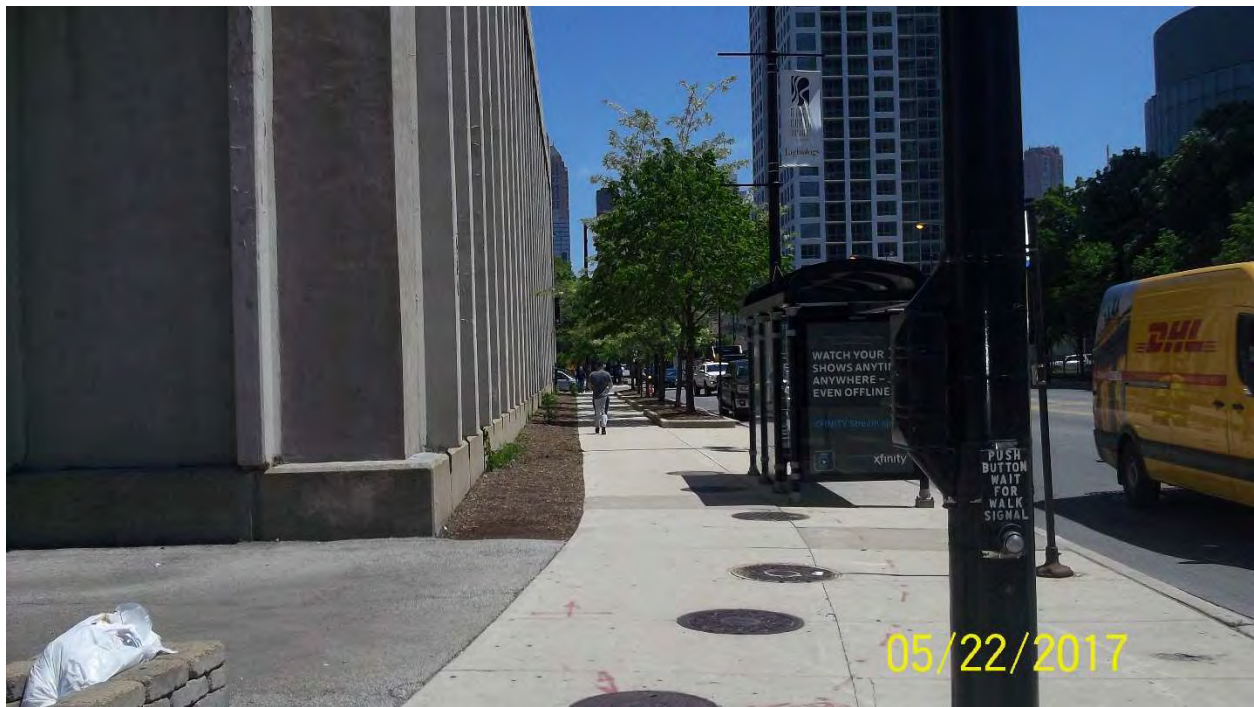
Northeast corner of Chicago Ave. / Larrabee St. – Looking East
